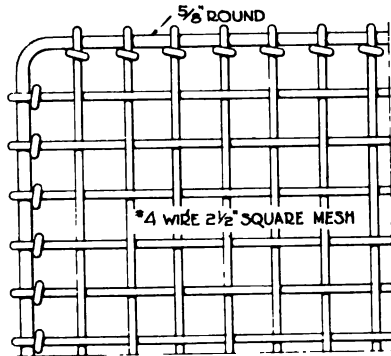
DETAIL OF WIRE FLOOR IN SMOKE HOUSES.
